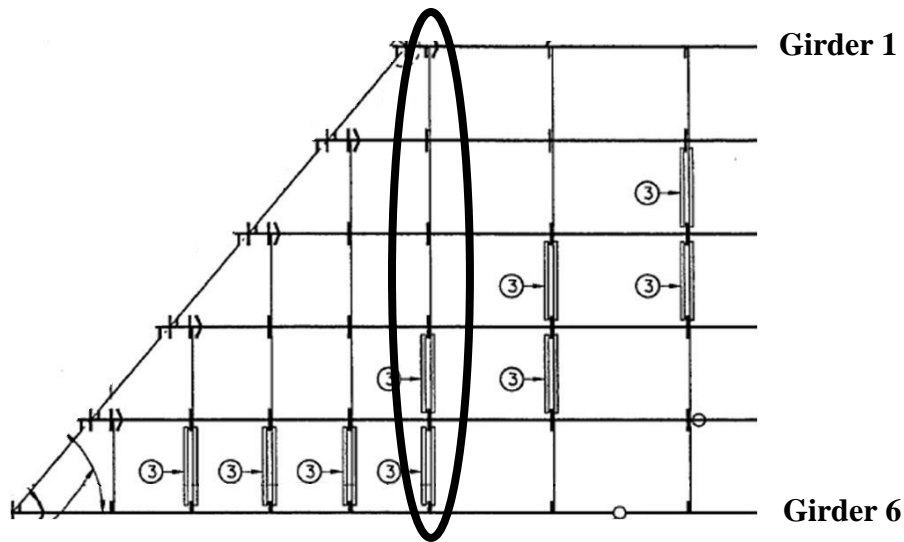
Cross Frame Layouts Leading to Differential Deflection Issues
